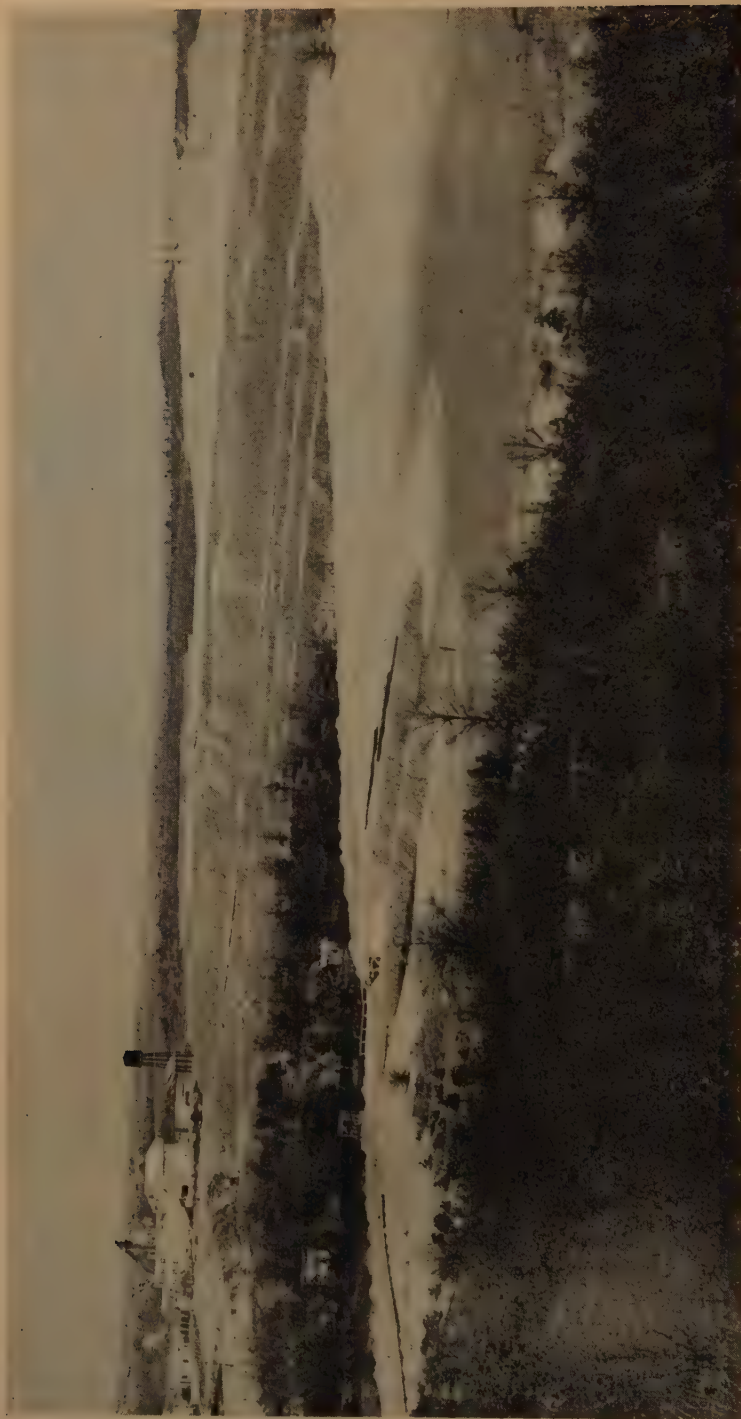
GENERAL VIEW OF DAM SPILLWAY AND PUMP HOUSE.
